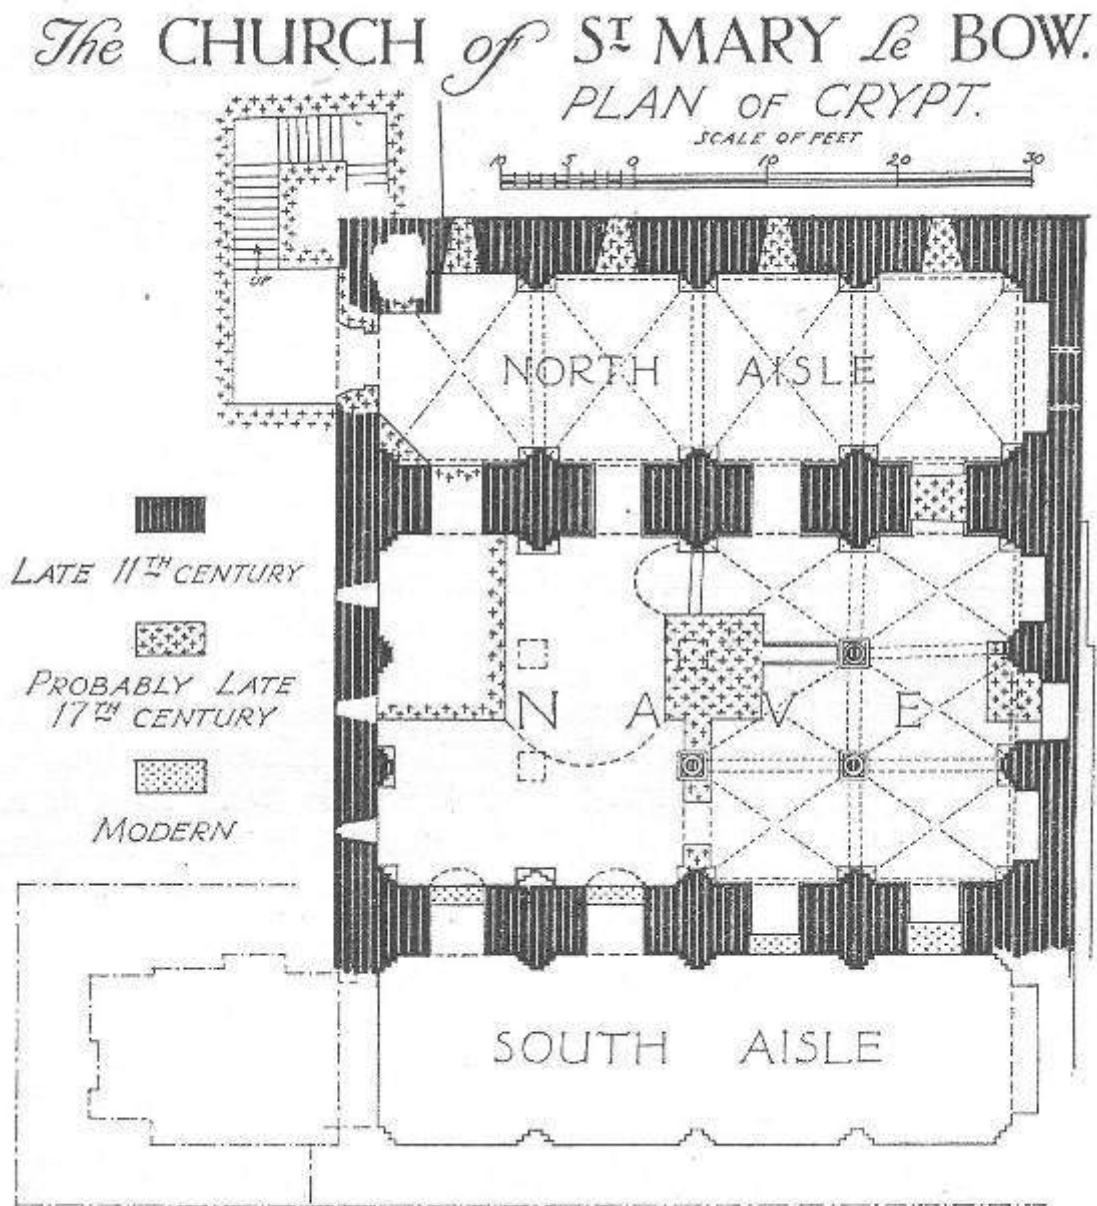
Plan of the crypt in 1929 (RCHME). The south aisle was then inaccessible
